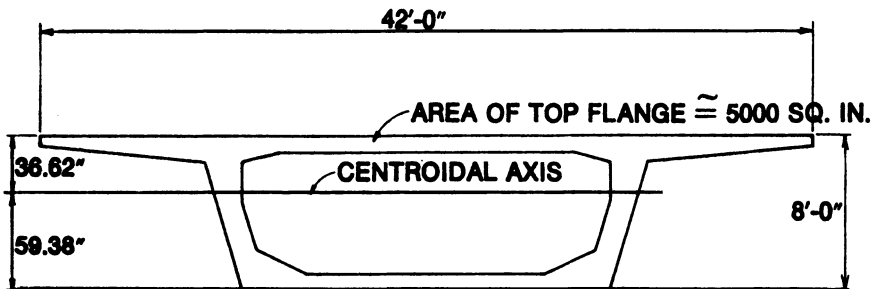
Cross section of a single-cell concrete hollow-box girder bridge superstructure.
